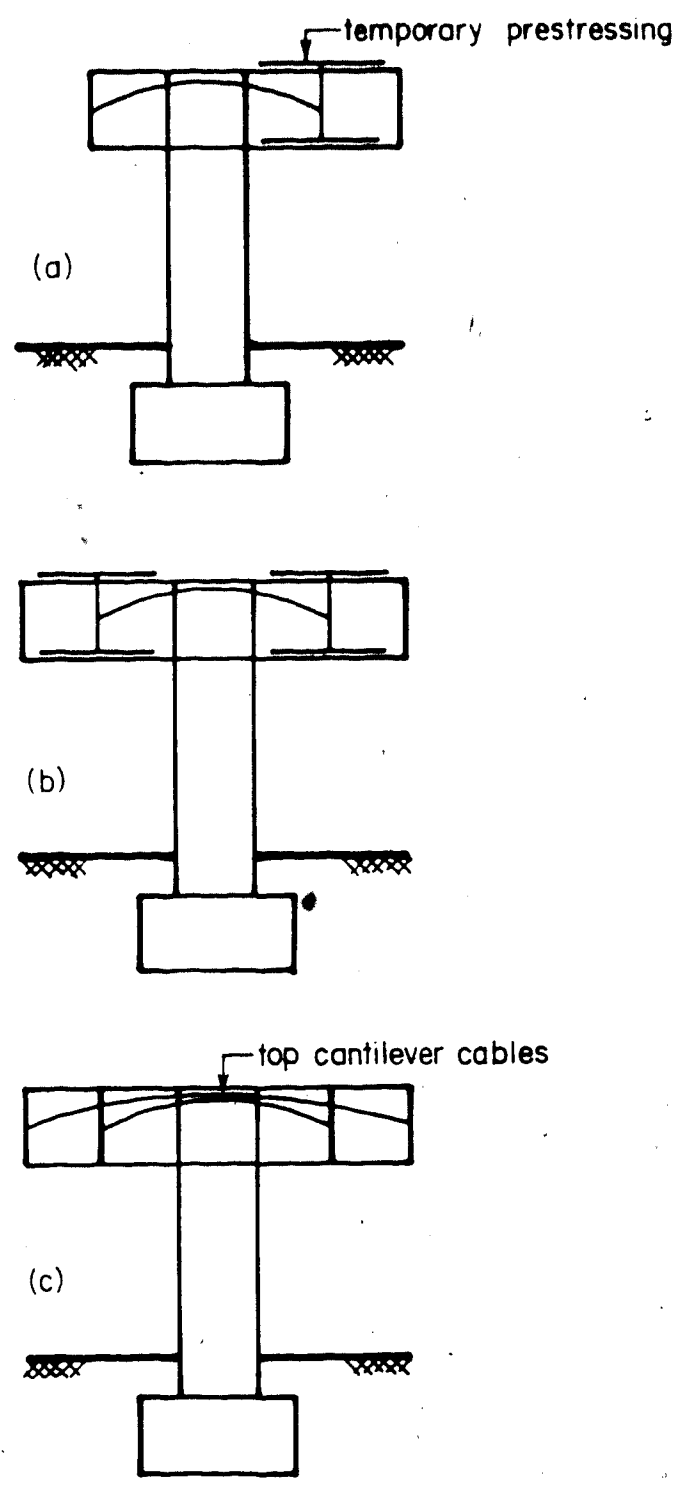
Balanced cantilever construction (erection of cantilevers)
